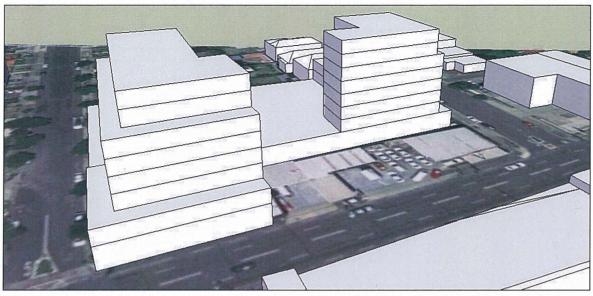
Building Envelope – subject site looking south from Canterbury Road
